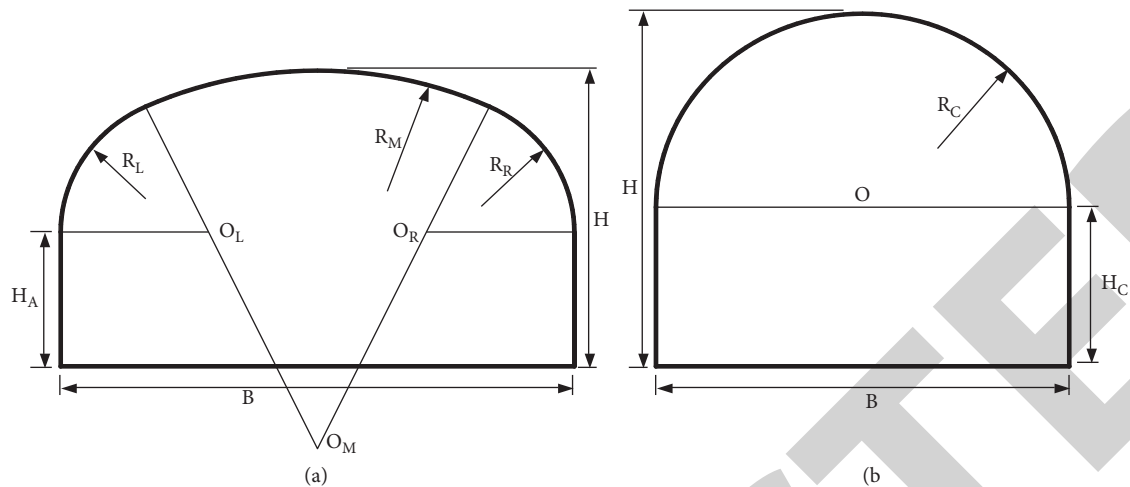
Section composition of two tunnel sections. (a) An arched section and (b) a circular arched section.
